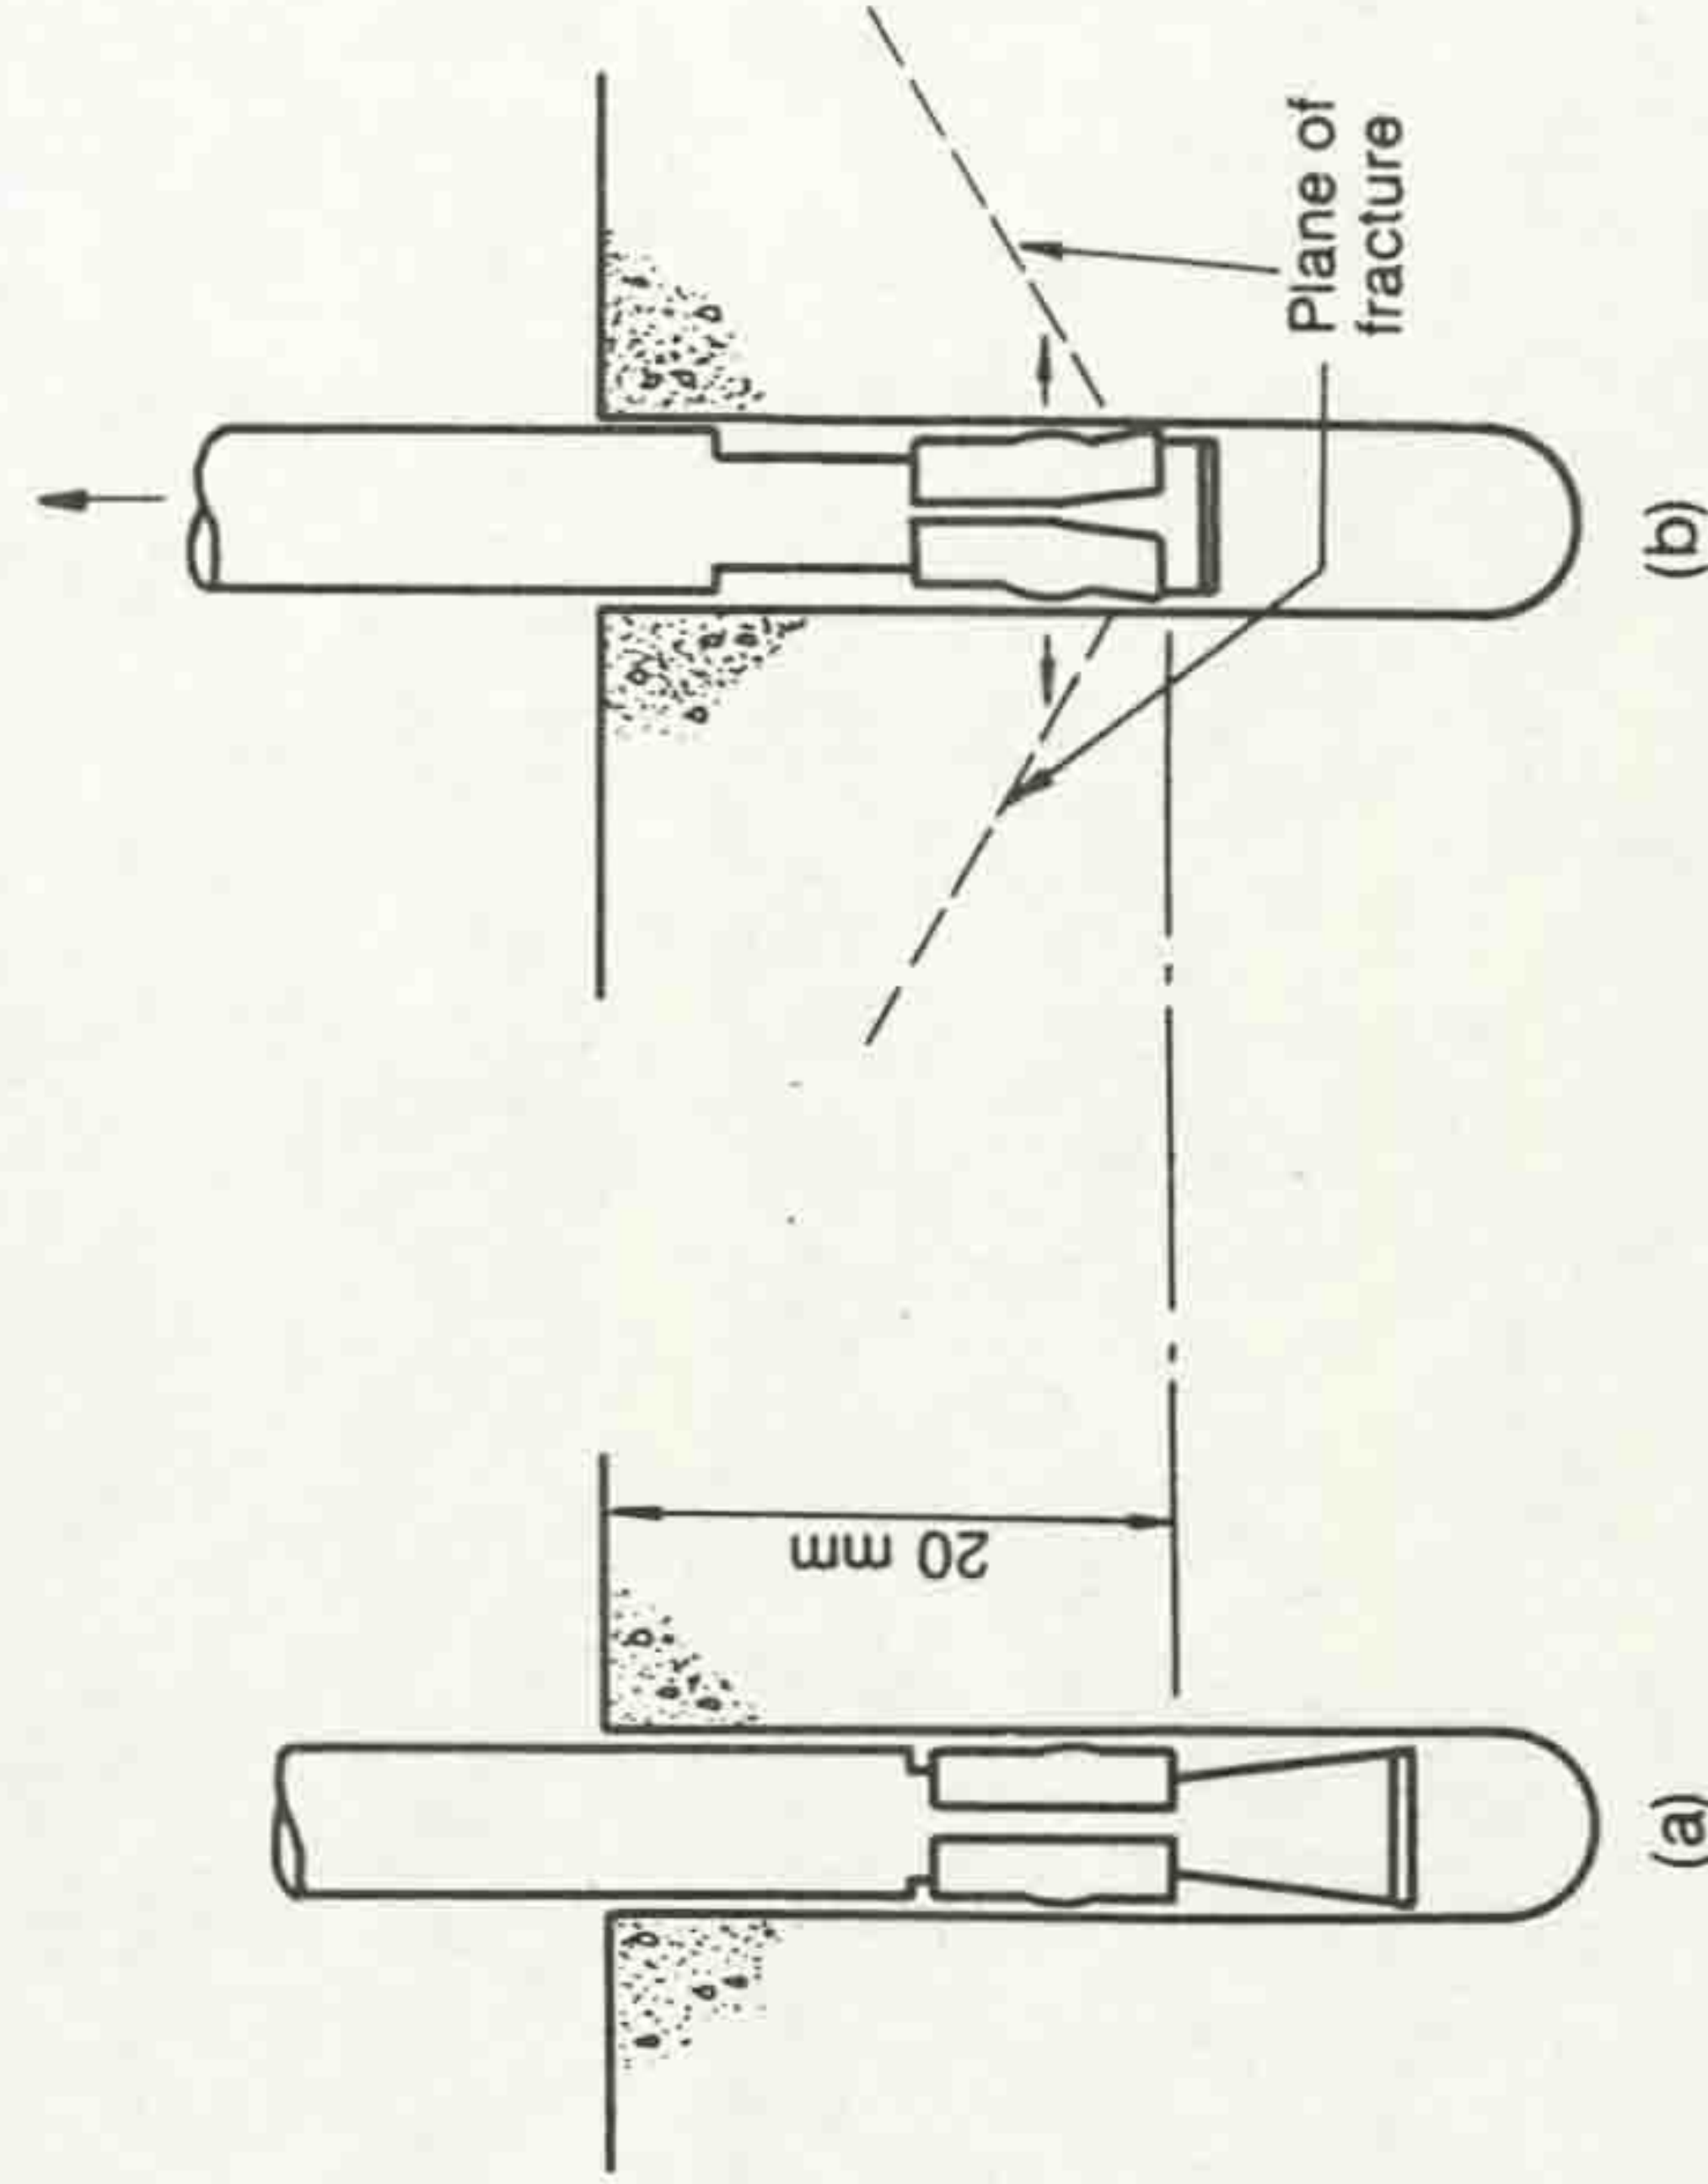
Pull-out of wedge-anchor bolt: (a) bolt inserted into drilled hole; (b) anchor under load
